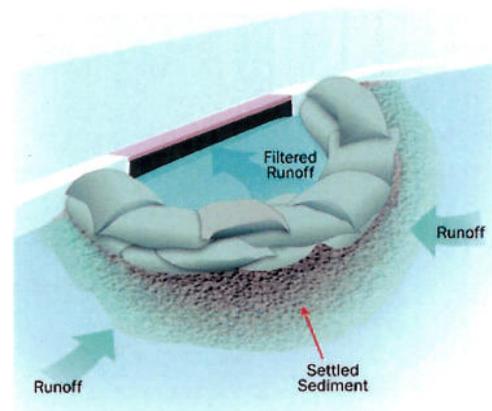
Illustration of a storm drain inlet with rock-filled bags filtering stormwater.
